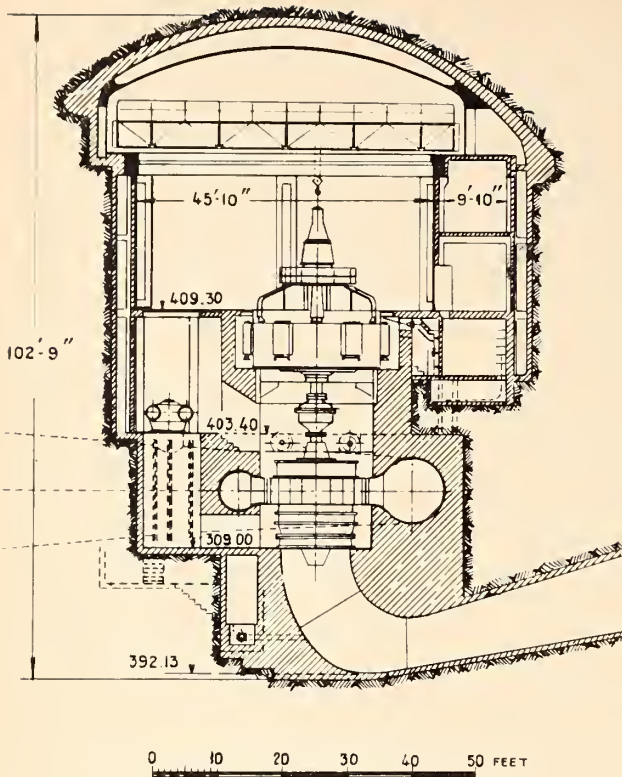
Left: Cross-section of the low-head Lavey underground power plant in Switzerland.
